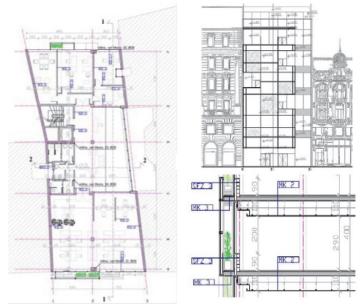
Plan of a typical floor, elevation and cross-section of the street facade of Model 2
